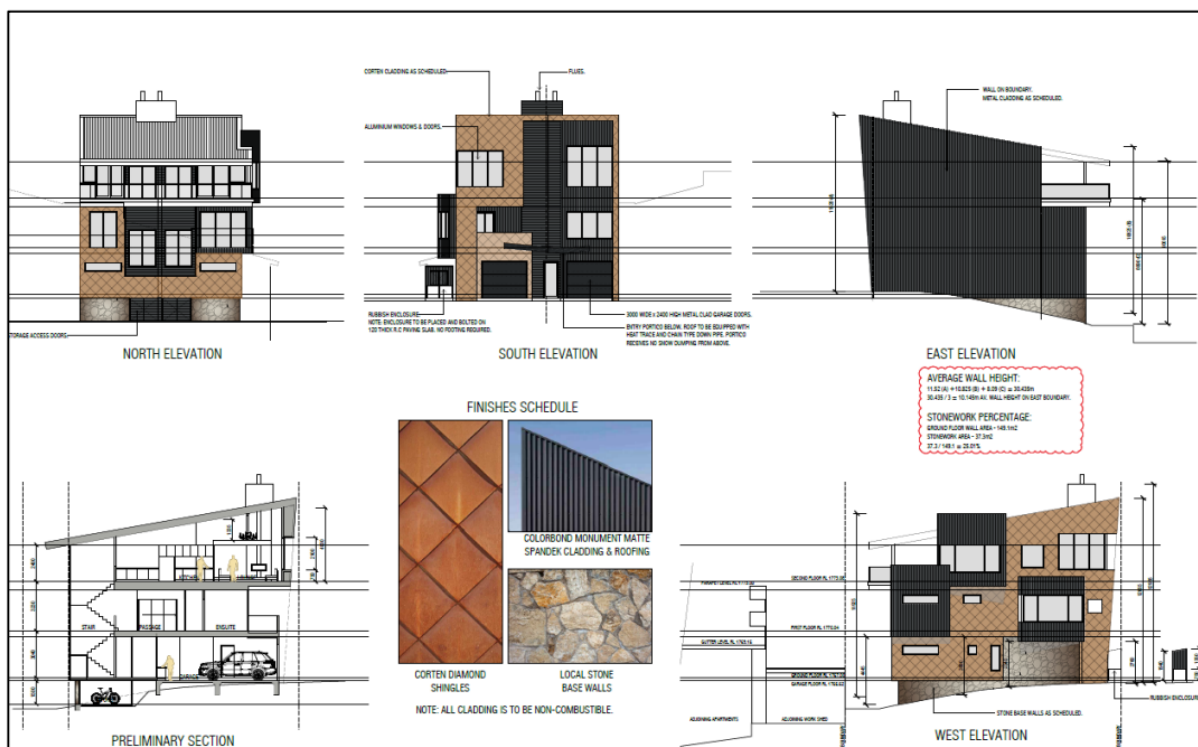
external elevations, sections and finished schedule source: applicant's planning report
